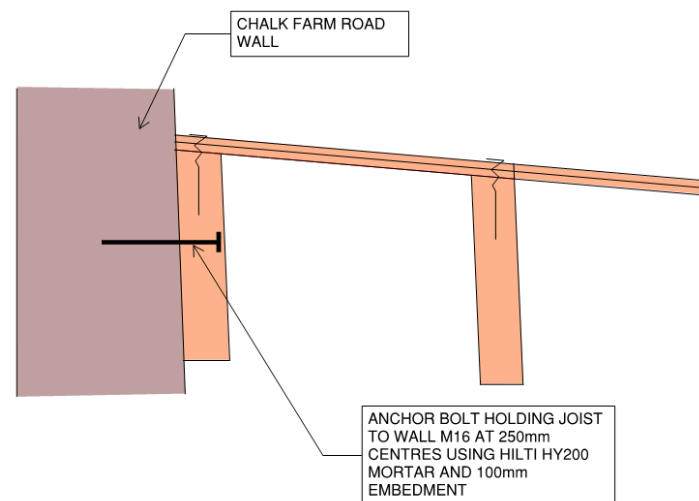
Proposed wall plate connection to Chalk Farm Road Wall
